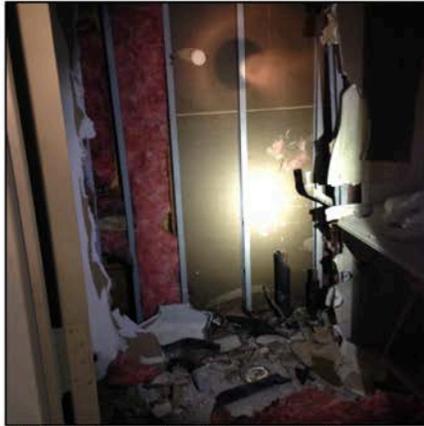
Fifth floor bathroom, looted of copper plumbing.
